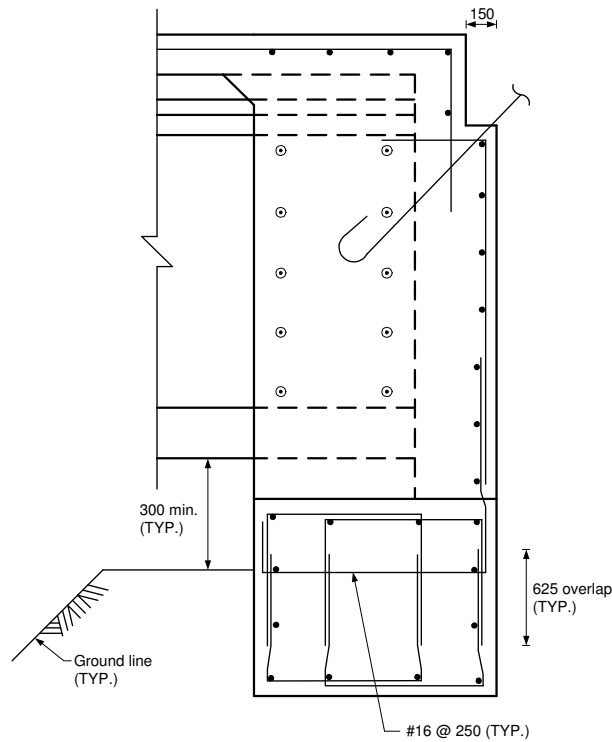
Integral Abutment Reinforcement, Girder, No Pile at the Section
